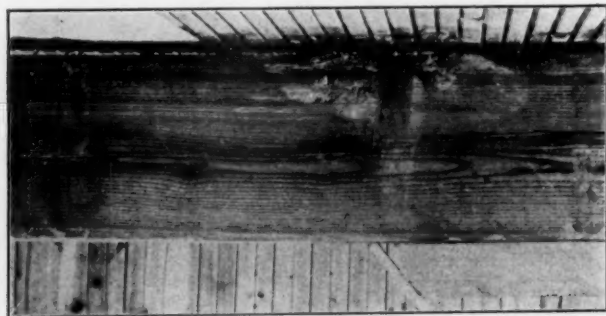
VIEW SHOWING FUNGUS BETWEEN DOUBLE BEAMS, FRONT BEAM HAVING BEEN REMOVED
